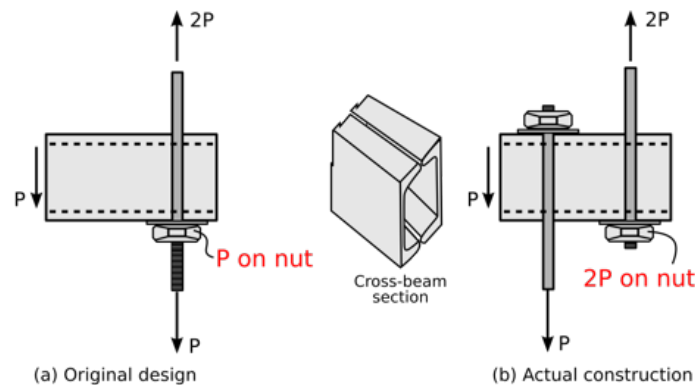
Connection details of the cross beam for the elevated walkway in the Hyatt Regency Center. Original connection design (a) and the modified design (b).
